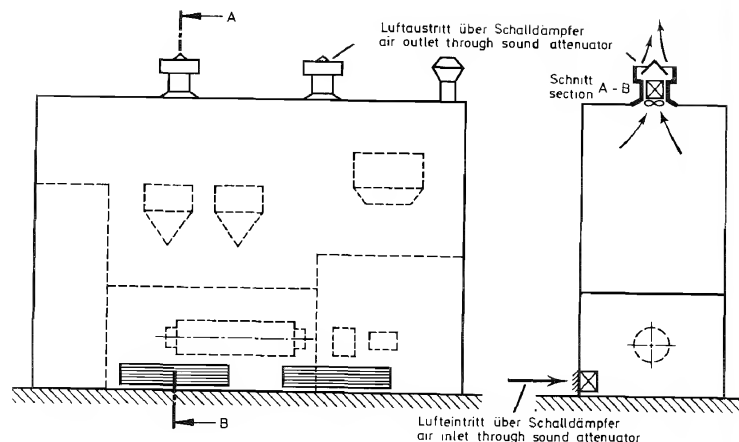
Induced-draught ventilation of a mill building: air extracted by fans
